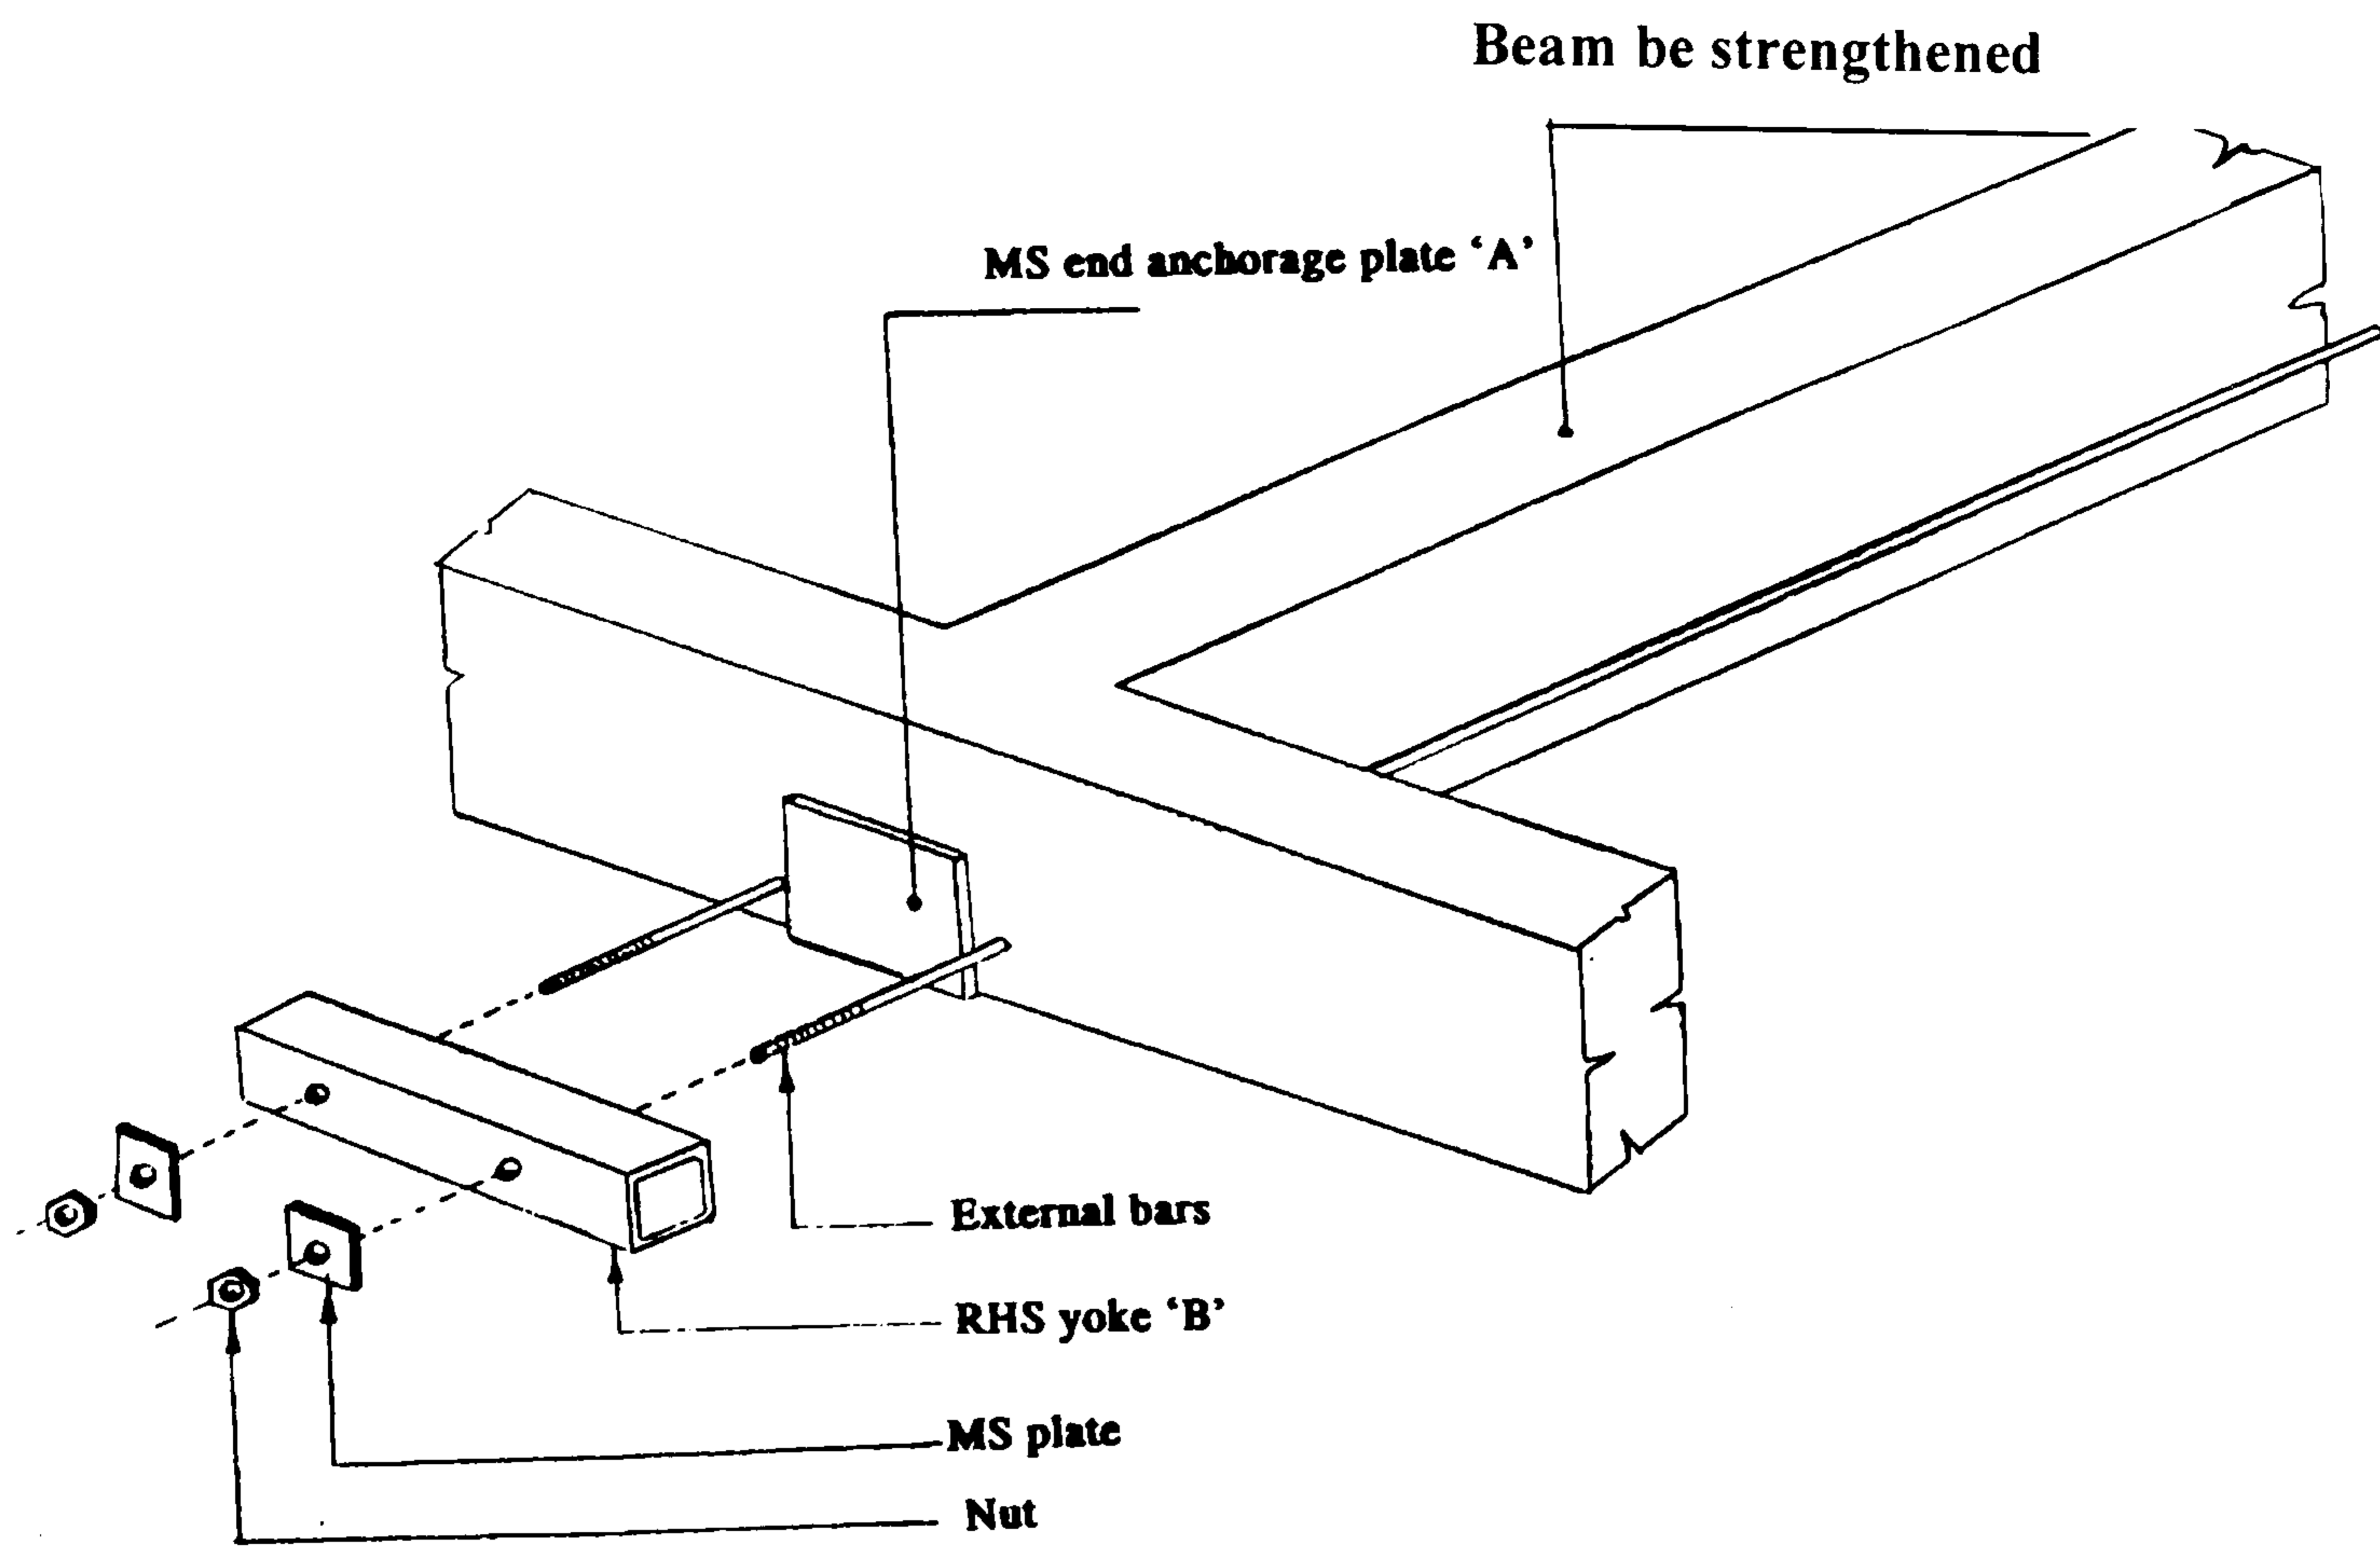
External un-bonded bars for strengthening RC beam. (After Rafeeqi ¹²)
